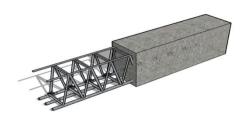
Design of frame-reinforced specimens with single compression reinforcement and frame-reinforced specimens with double compression reinforcement
